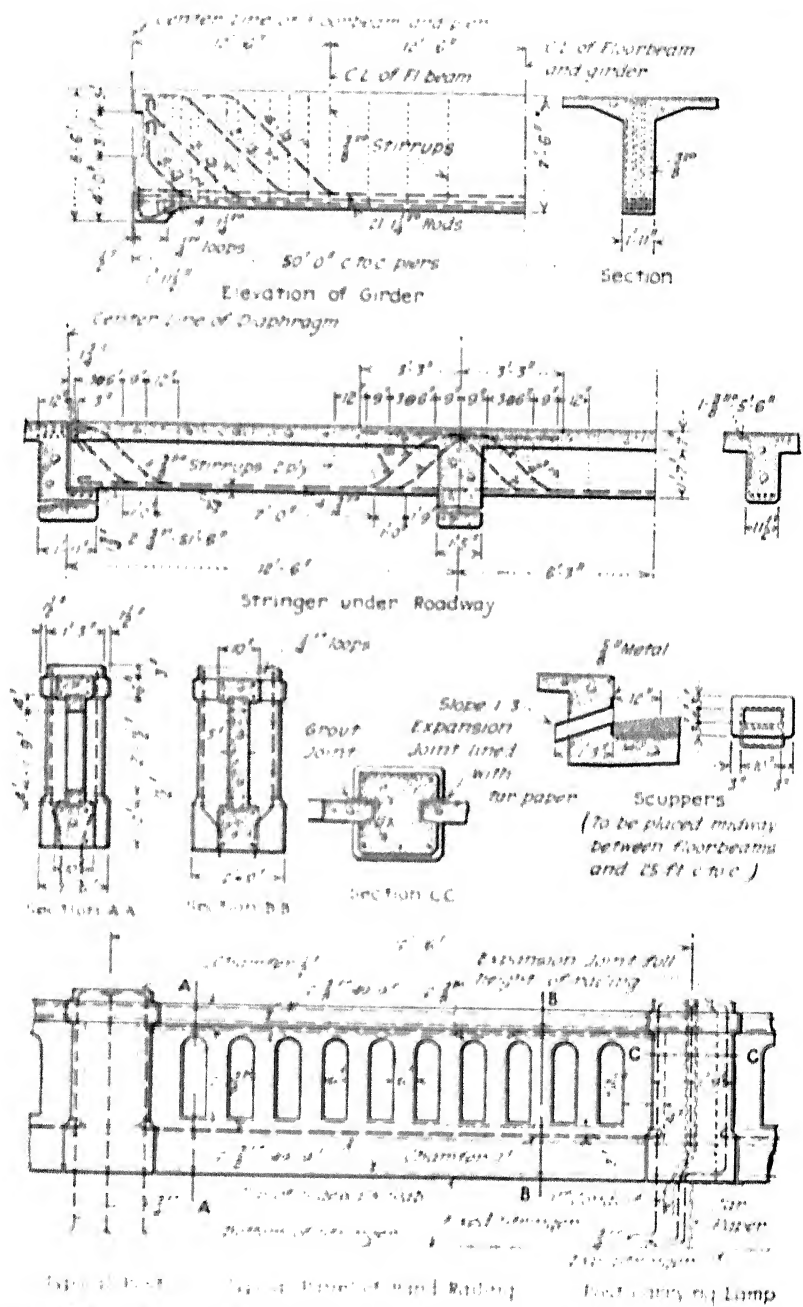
Details of floor system and riling, North Samuels Avenue viaduct.
